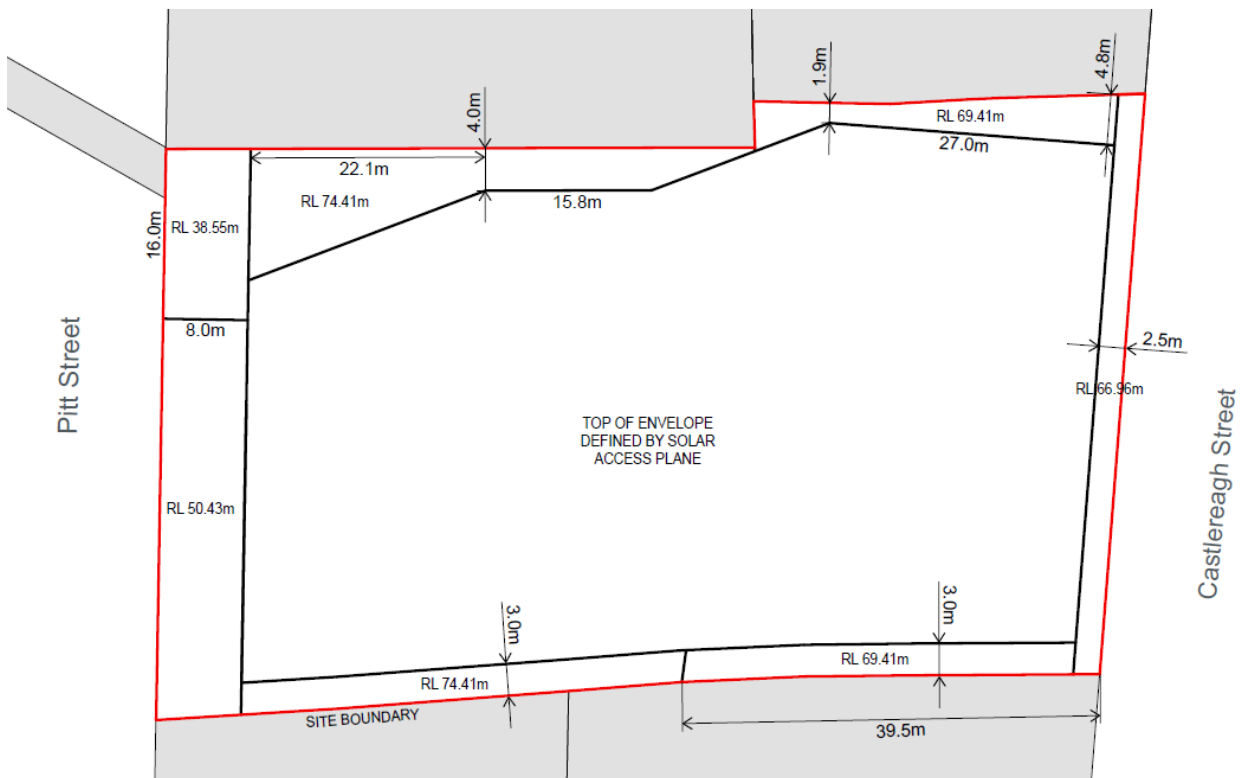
XX 133-145 Castlereagh Street, Sydney – commercial envelope – tower setbacks
